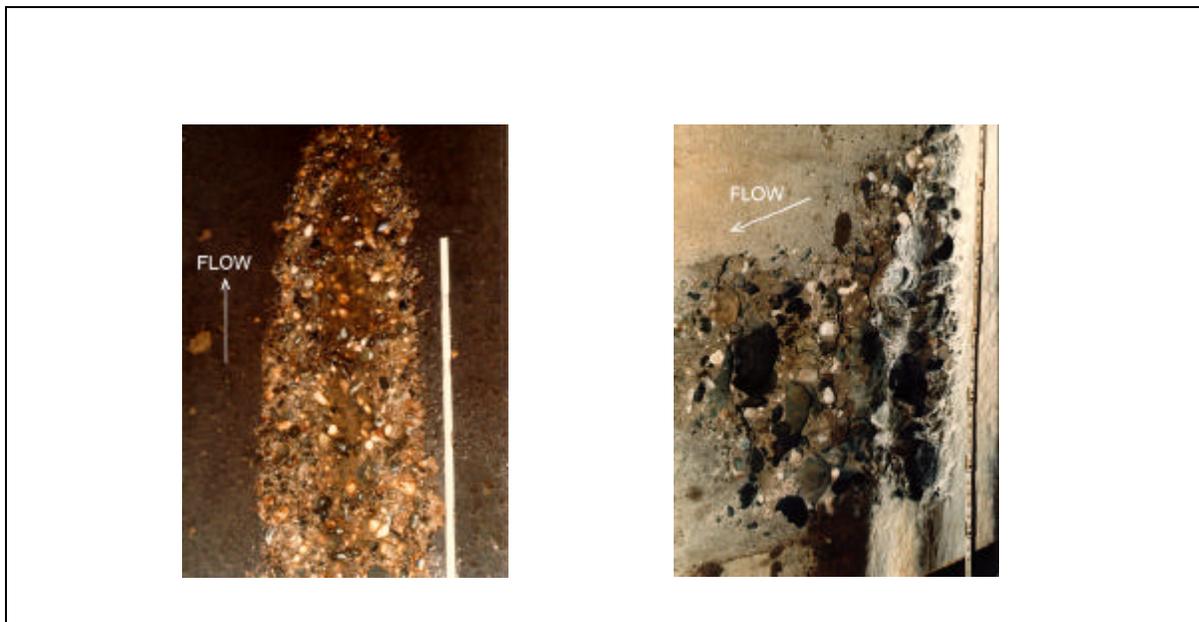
Damage to invert (left) and the sidewall (right) which occurred in 1987. This damage was 30 to 40 feet downstream from the end of the metal liner.
